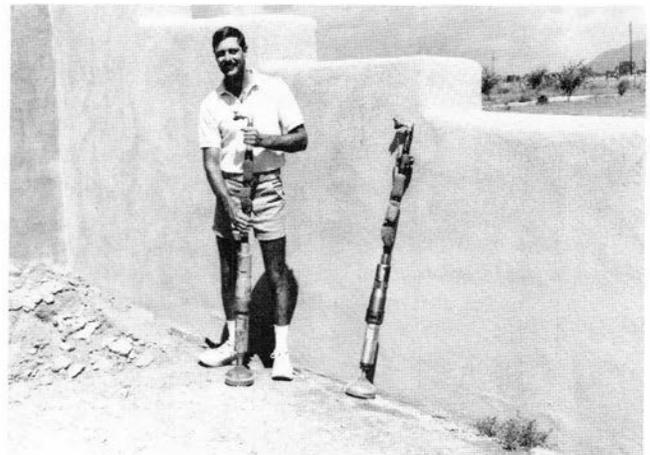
Stan Huston holding one of the Ingersoll Rand 341 backfill tampers that are hooked up to a 125 Schramm compressor for tamping rammed-earth walls. Huston Construction Company building site, Edgewood.
